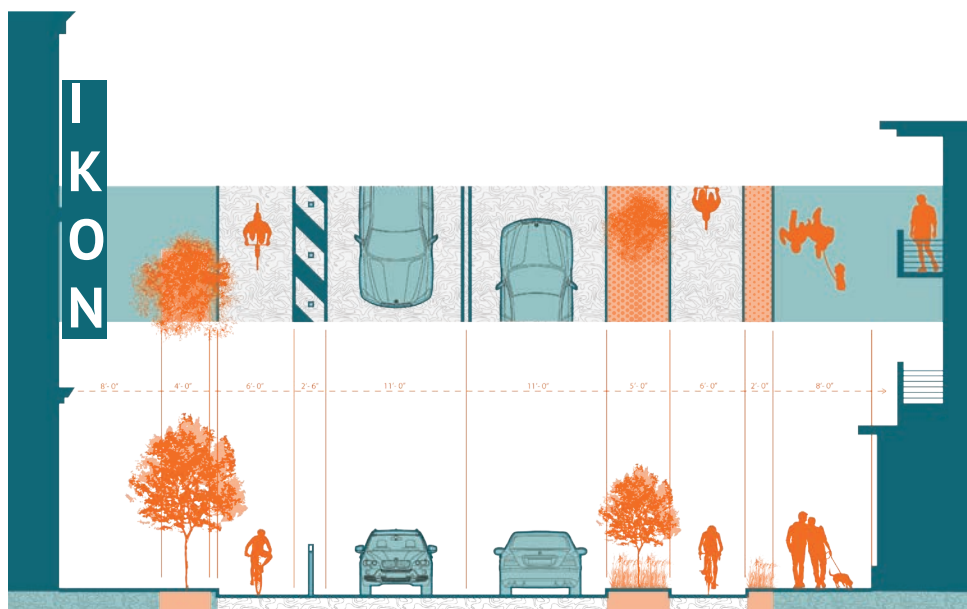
Fond du Lac Avenue Improved Section- 1"=14'-6"
